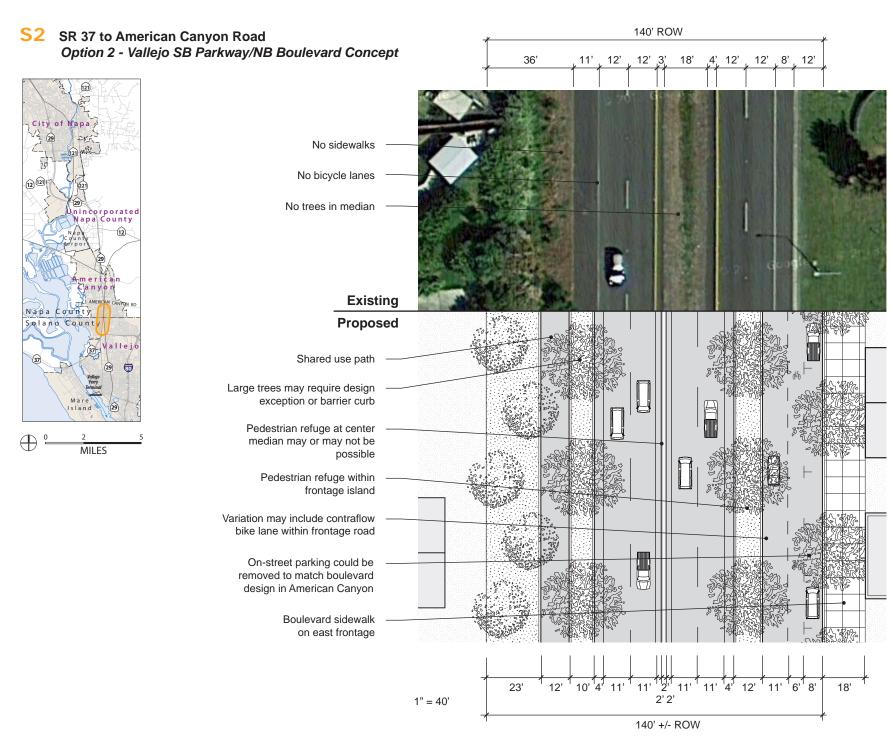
Existing and Proposed Conditions - Section 2 Parkway Concept
